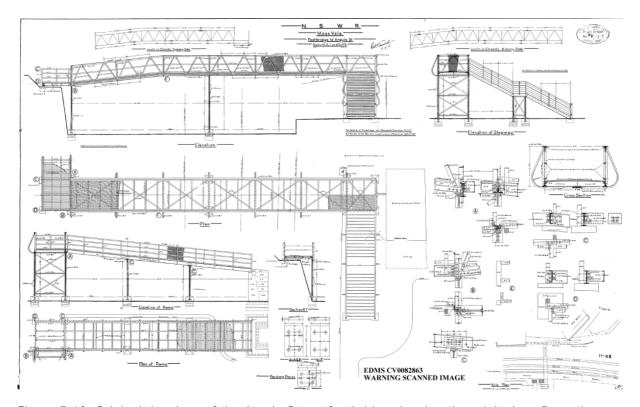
Original drawings of the Argyle Street footbridge showing the original configuration and detailing from 1915. (Source: Sydney Trains Virtual Plan Room, provided by Architectus, May 2023)
